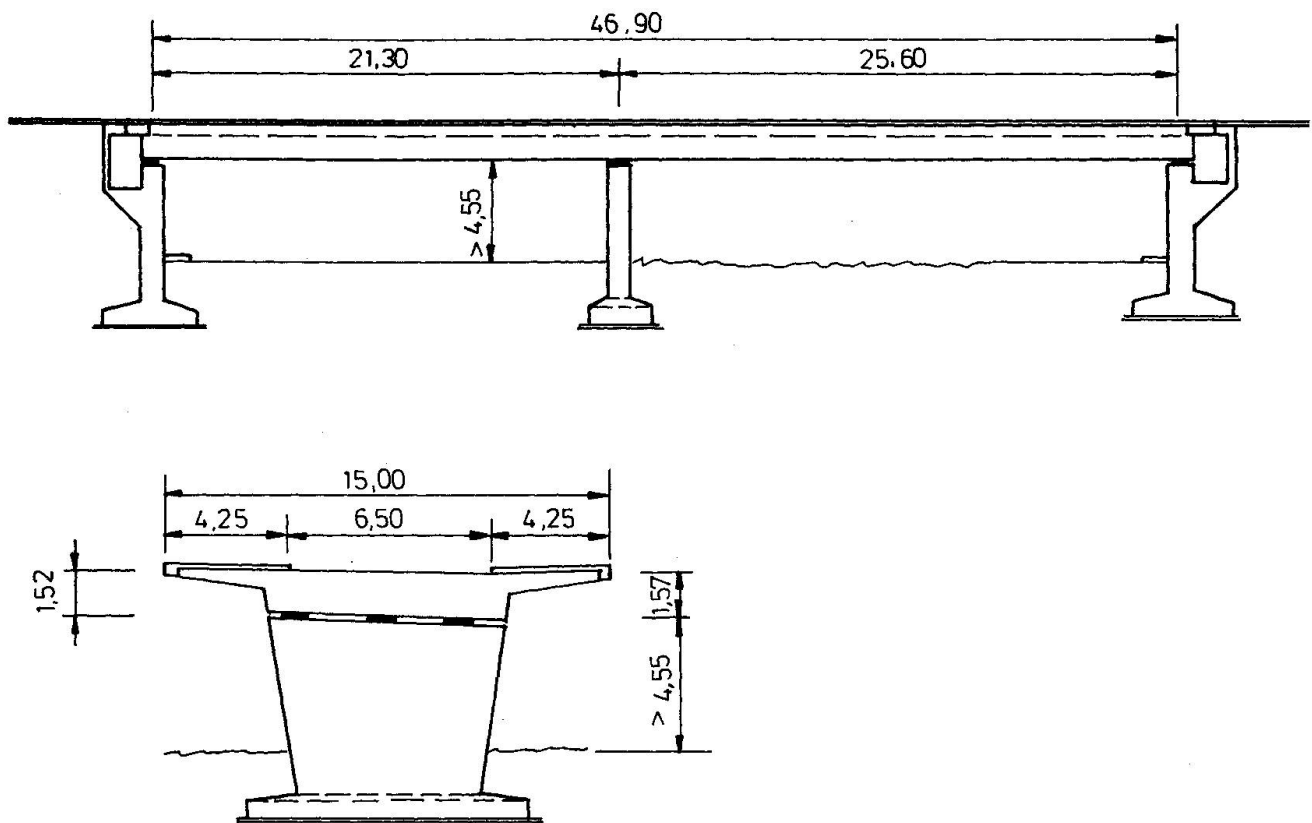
Bridge Ulenbergstraße, Longitudinal and cross sections
